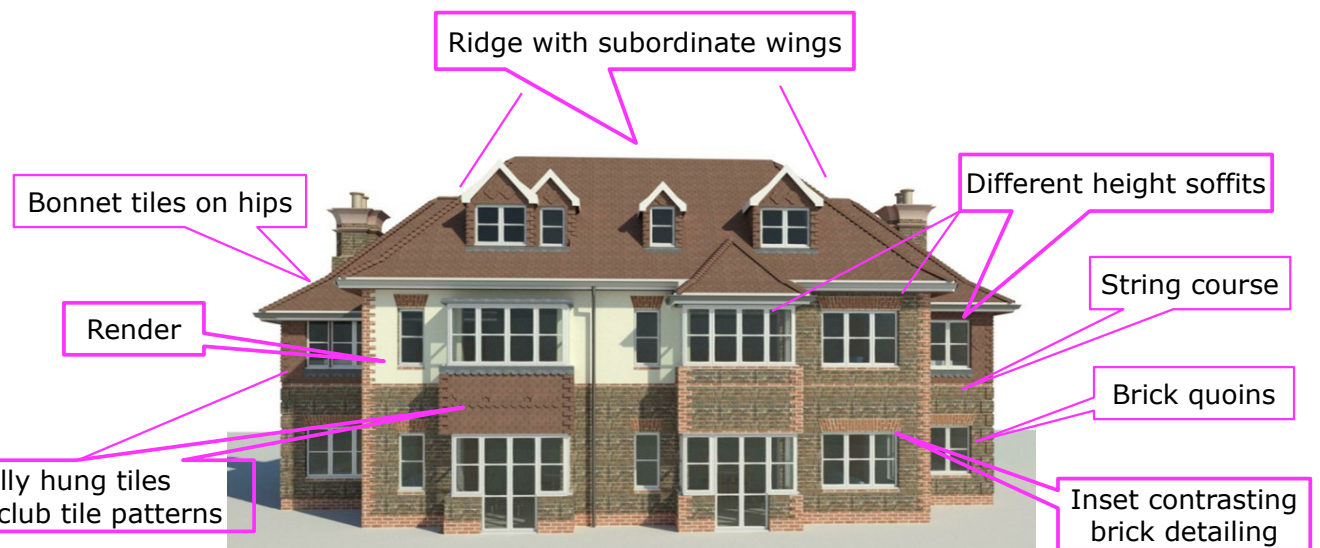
above shows the front facing features of the proposed development.
